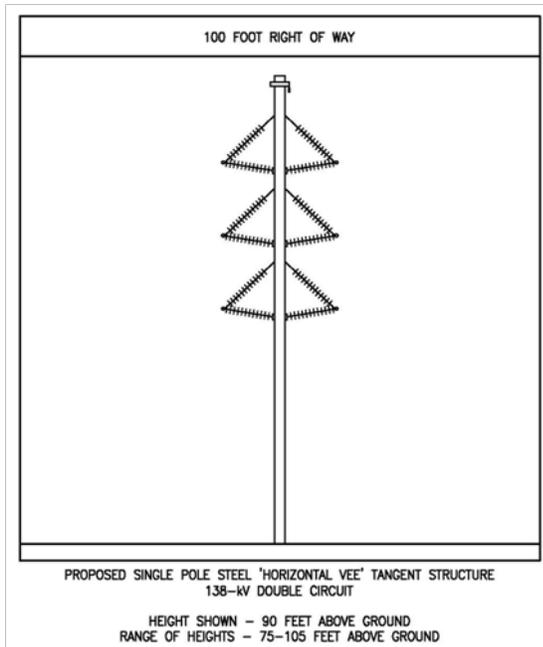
Typical Single-Pole Steel Structure Profile.
